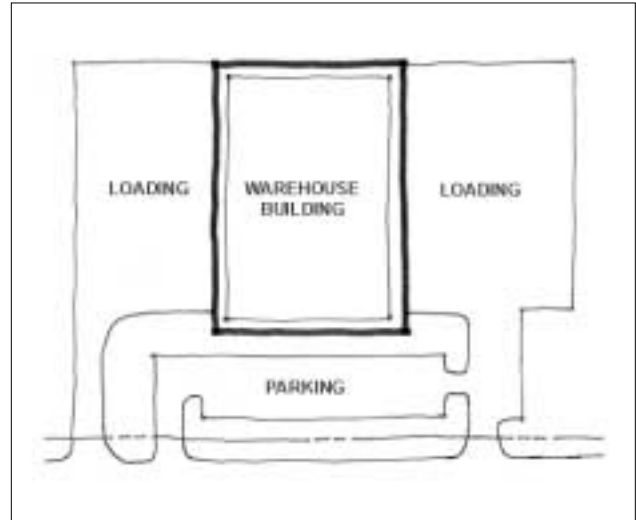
Before. Building and parking comply with current M-1 setbacks, parking is in front of the building and multiple driveways provide site access.
